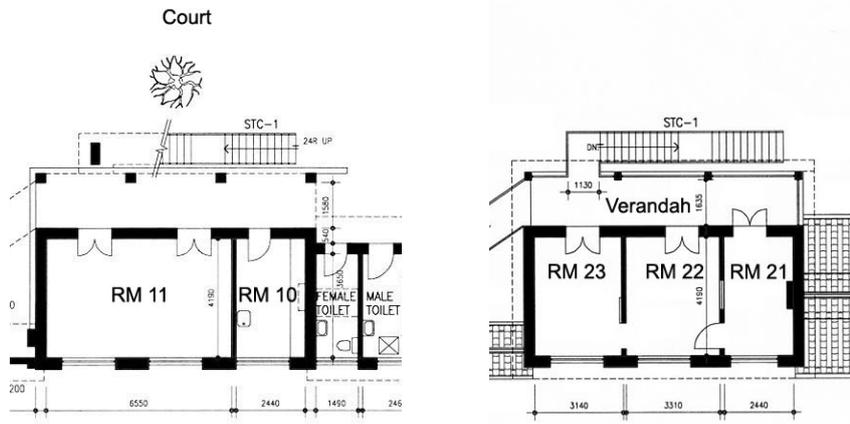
Floor plans of the Annex A, ground floor (left) and first floor (right).
